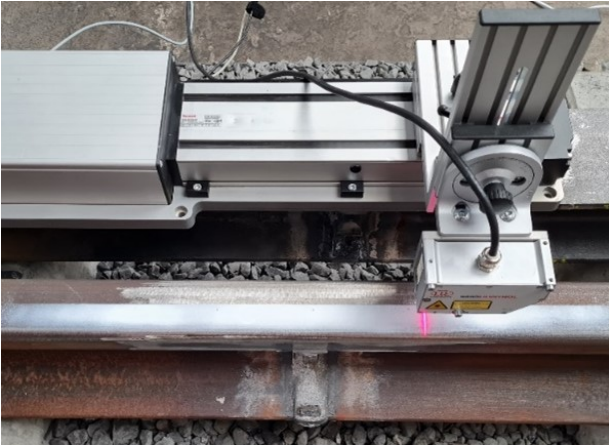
Step-shift laser head assembly for measuring the flatness of the running surface.
